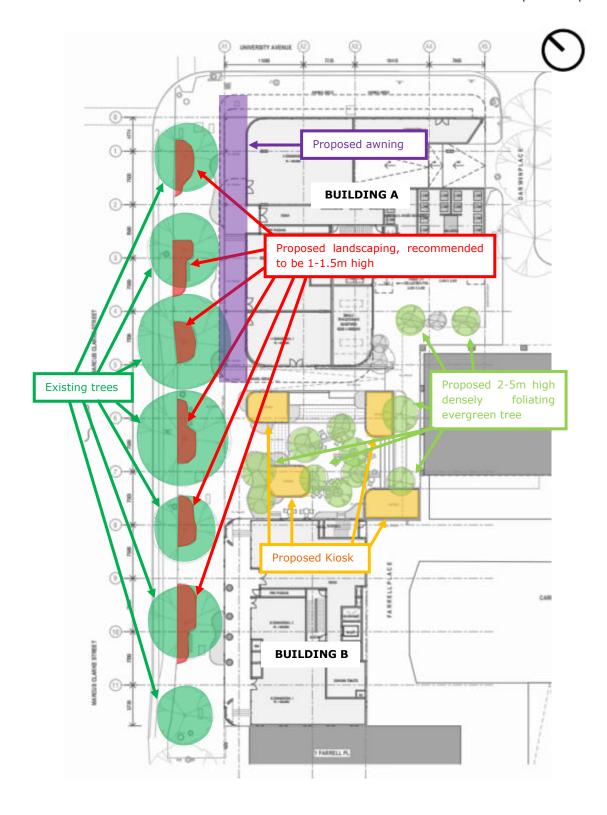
Ground floor plan with the proposed wind control measures overlaid
